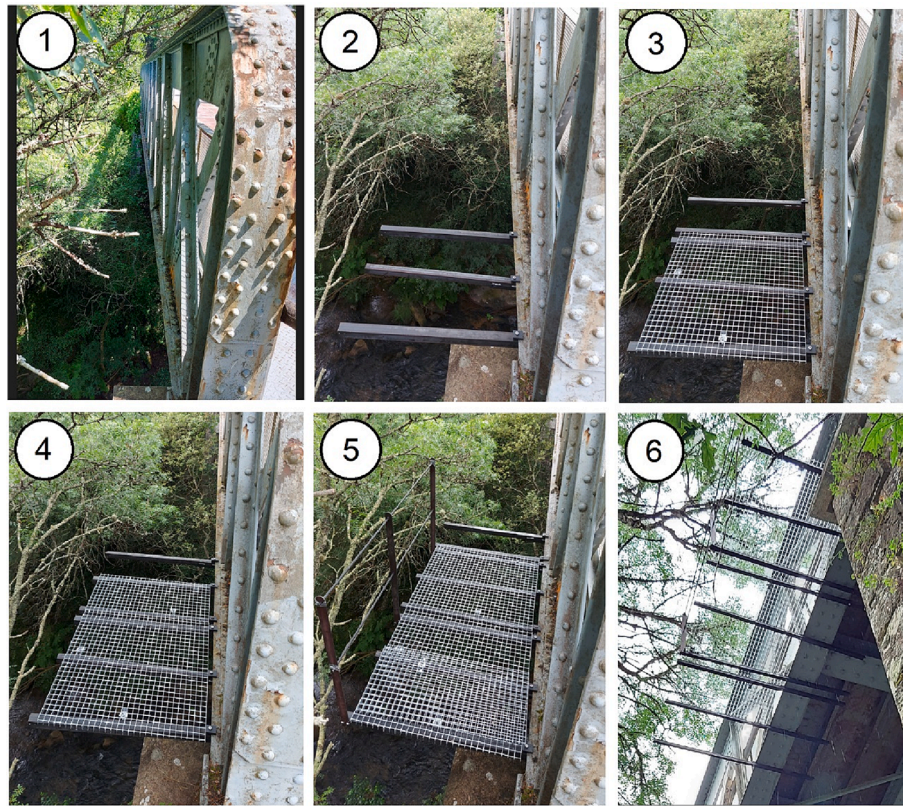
Steps to assemble the developed detachable walkway system on the steel bridge over the Gadanha River.
